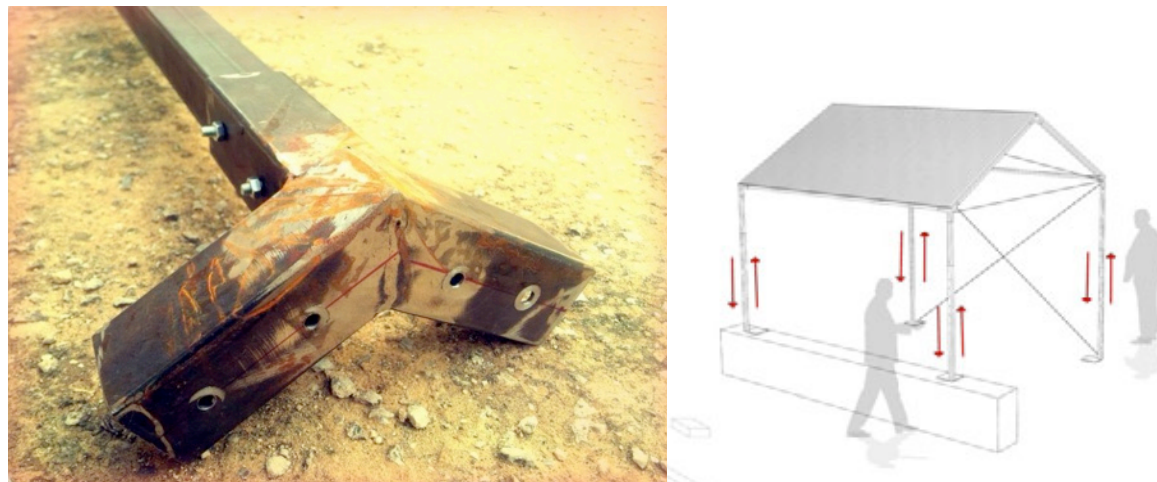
Left: Joint detail Right: Columns height is adjustable to uneven ground.
